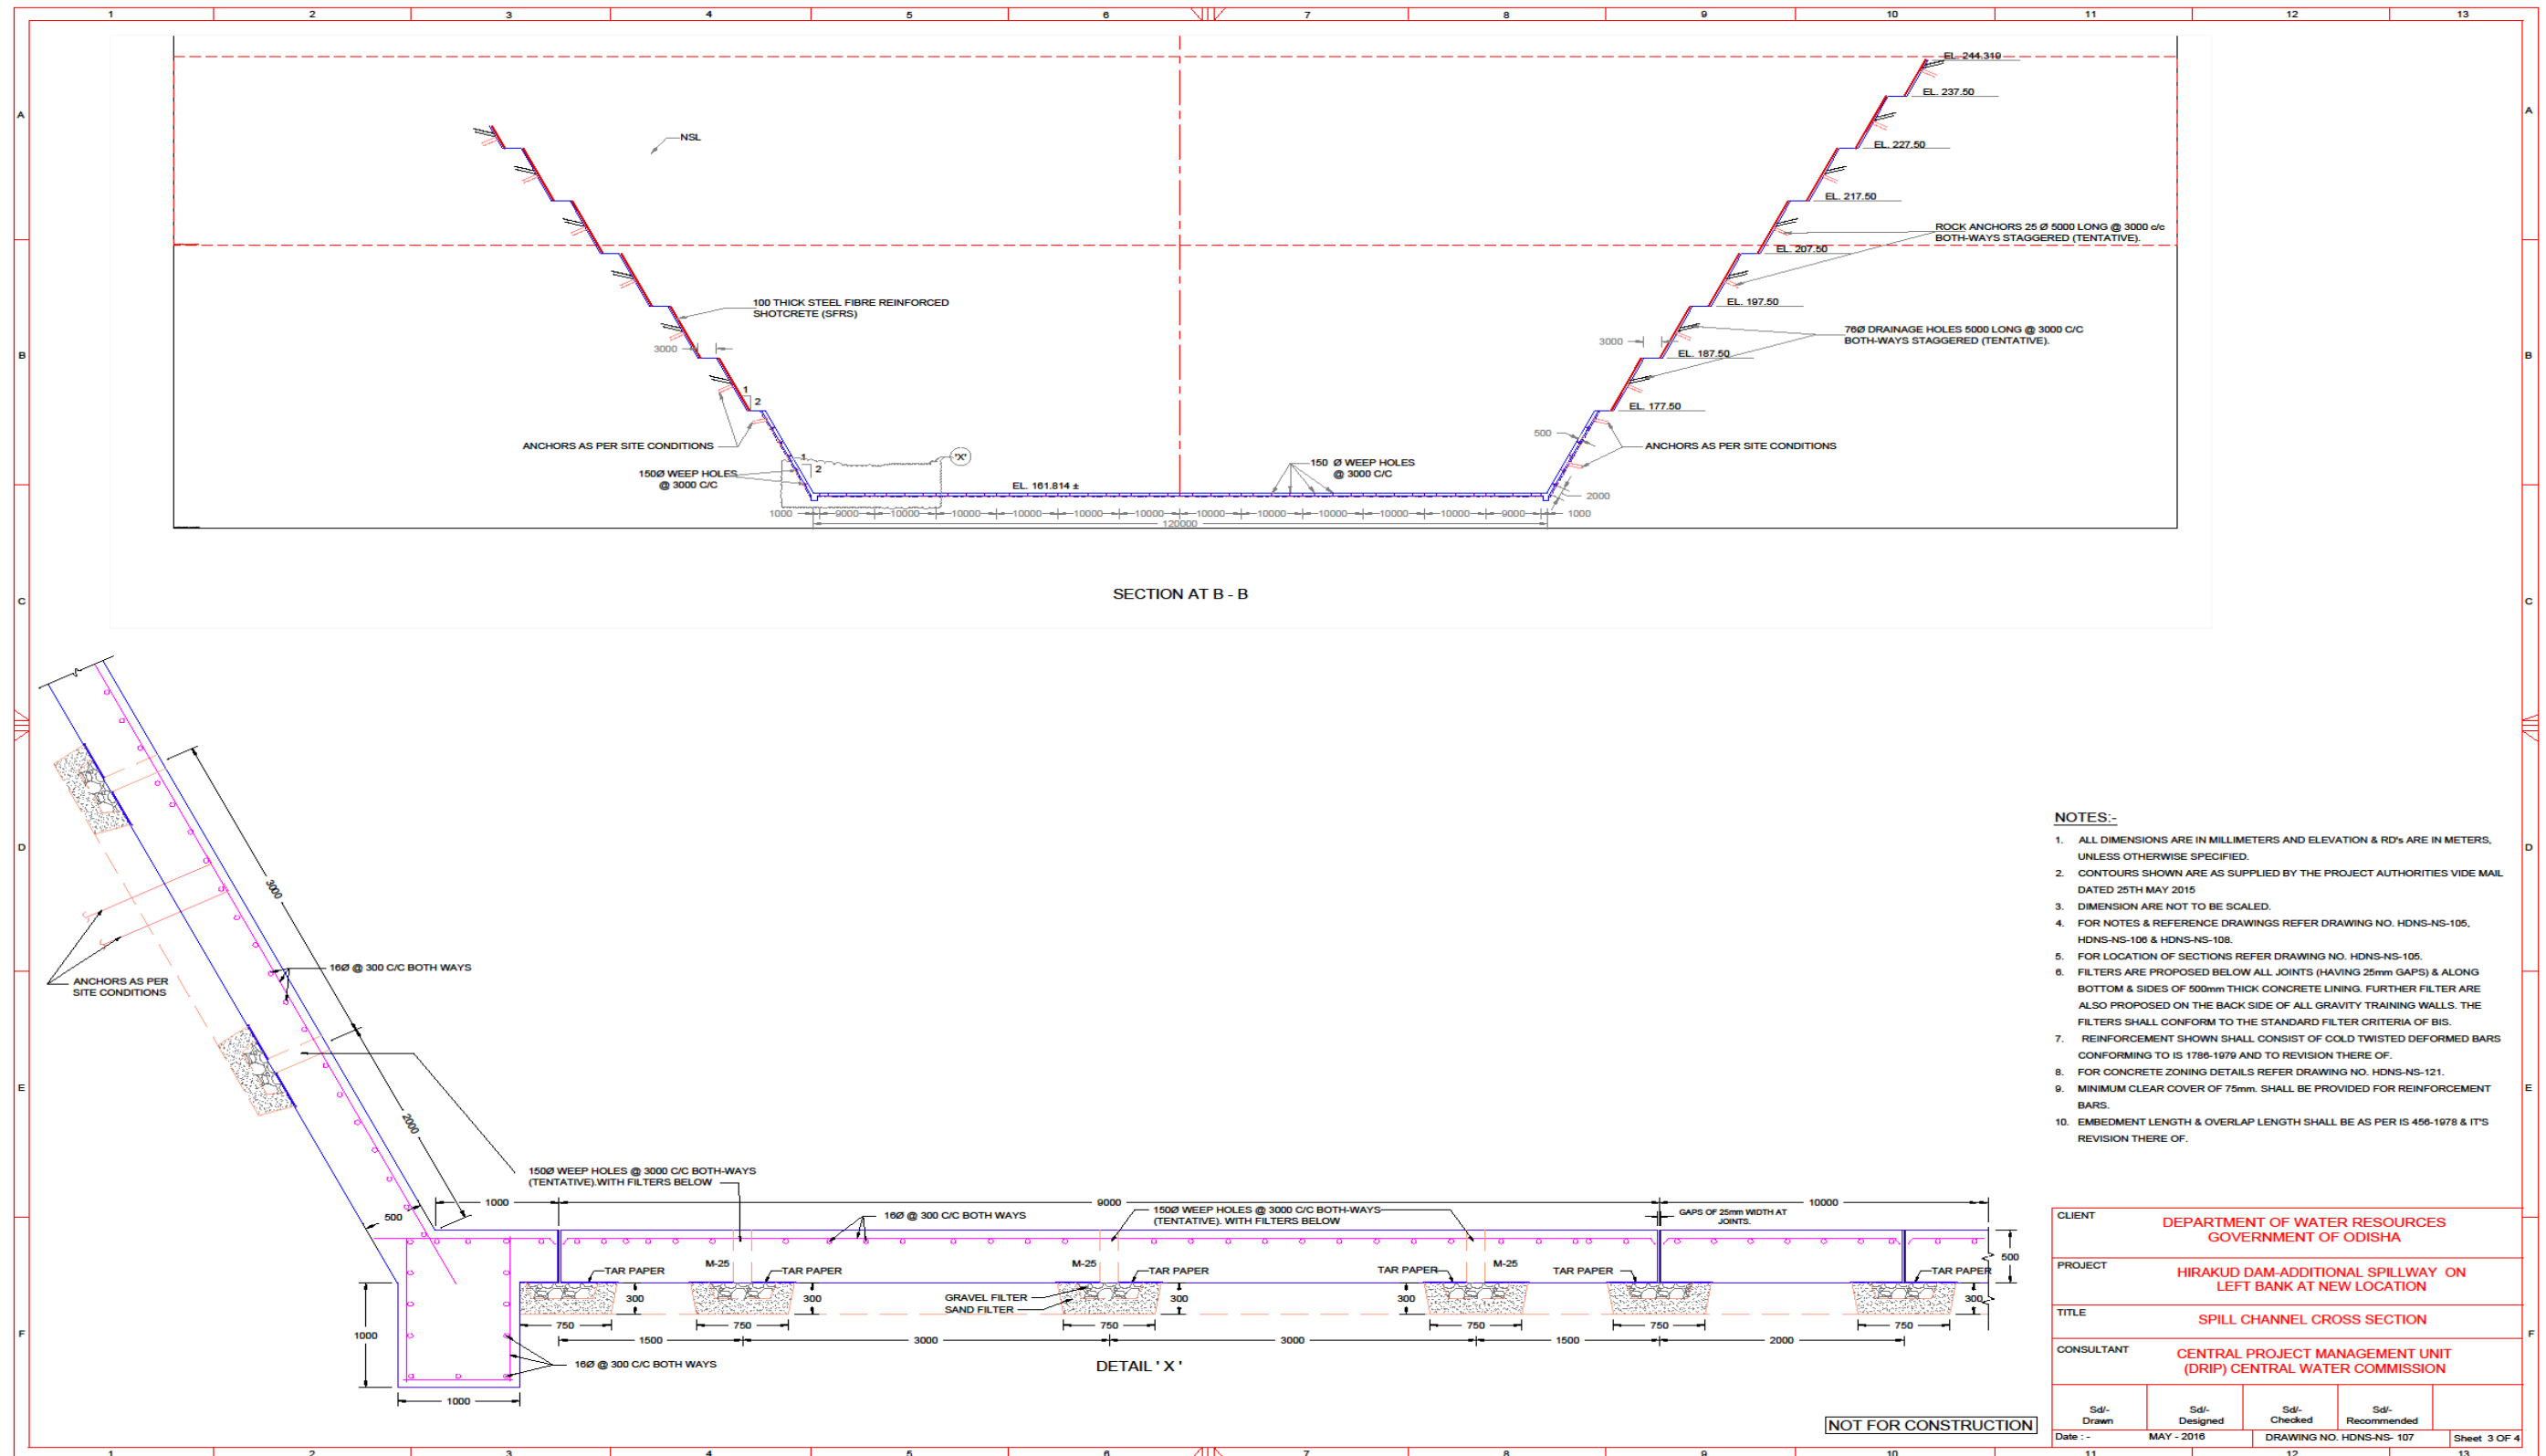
REINFORCEMENT DETAILS SECTION PLAN
